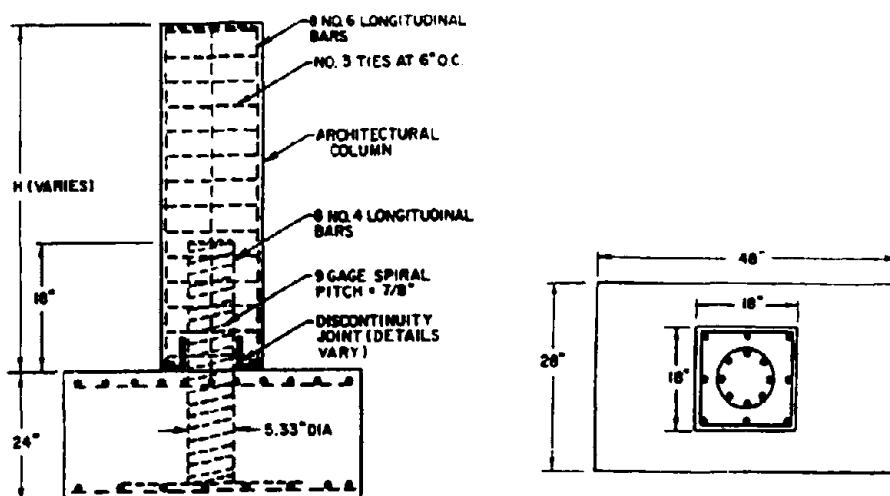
1/5-Scale Specimen Details (after Ref. 22).
